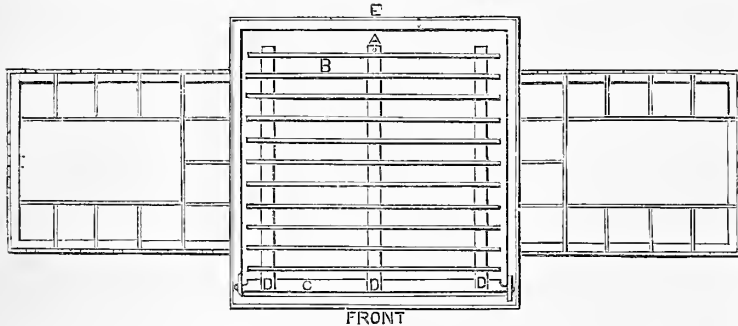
GROUND PLAN OF POULTRY HOUSE.
